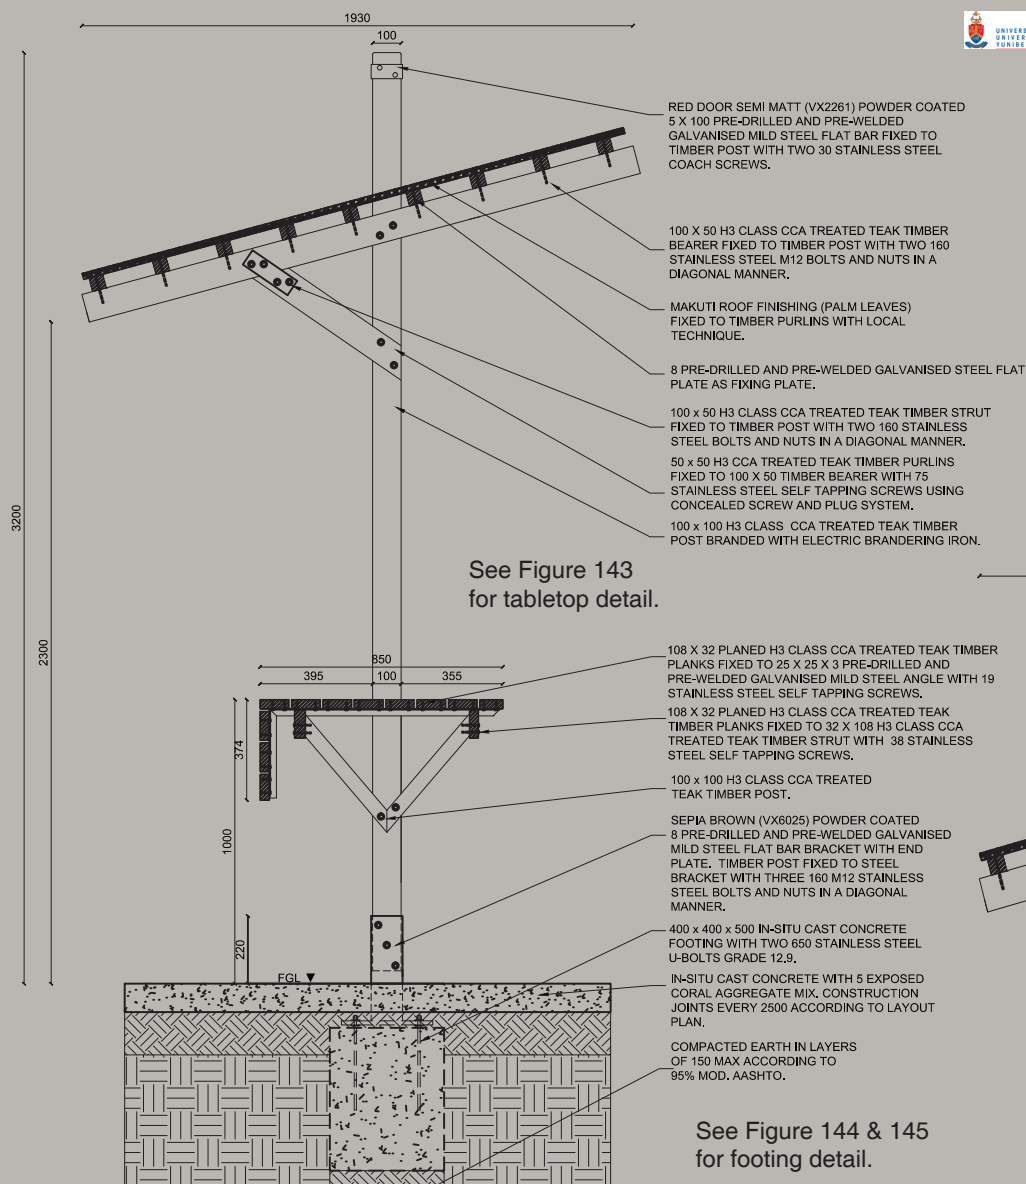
Detail Section (1:20) of Market Stand (Author, 2014).
